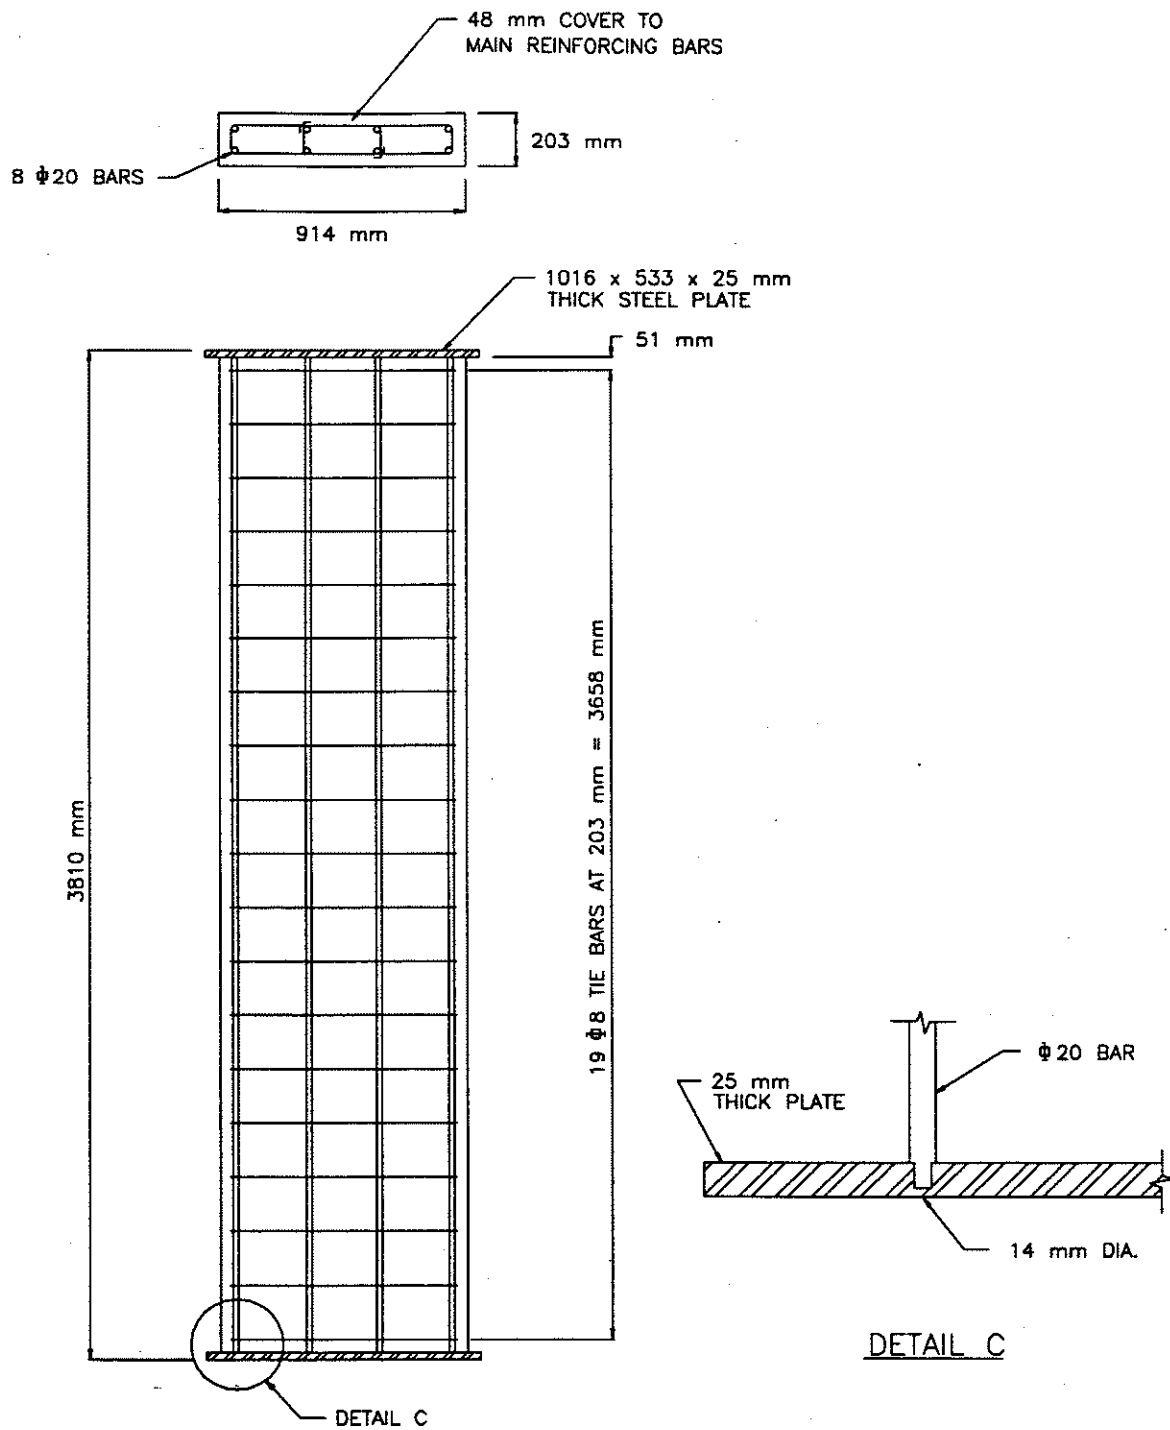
Elevation, Cross-Section and Finishing Detail:
